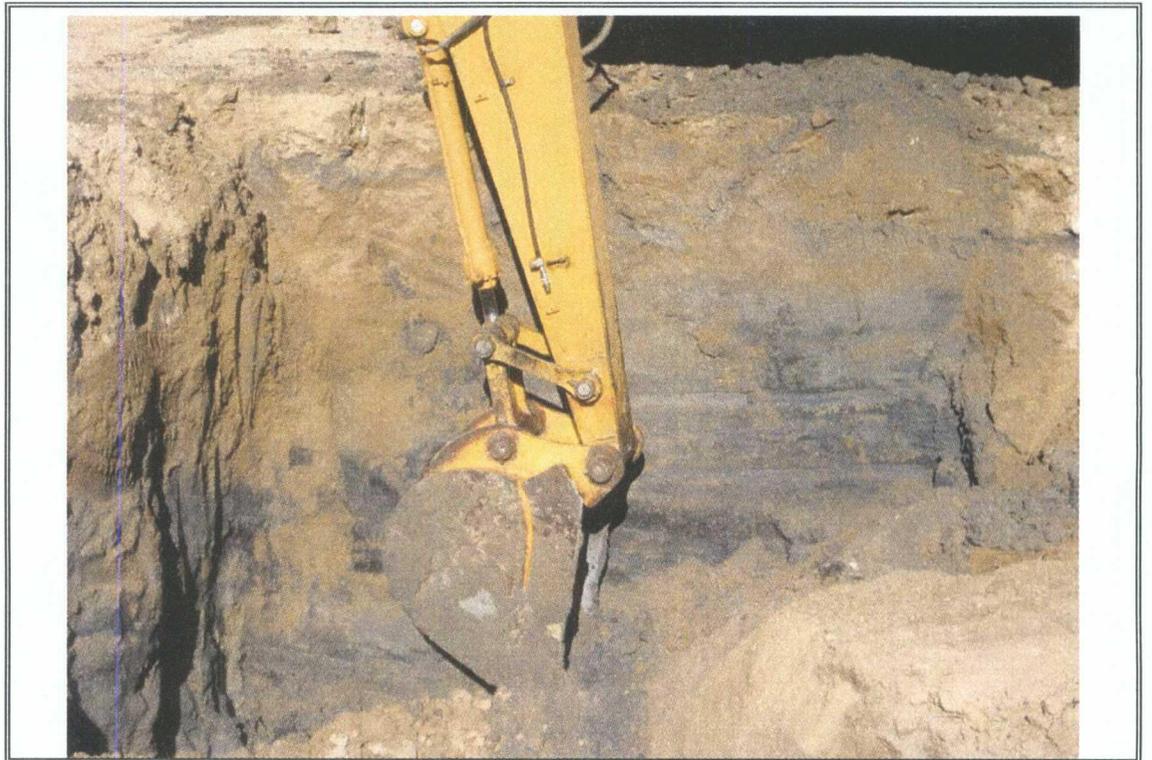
Photograph Number 6: View of contaminated soil staged west of the former Clark building.
